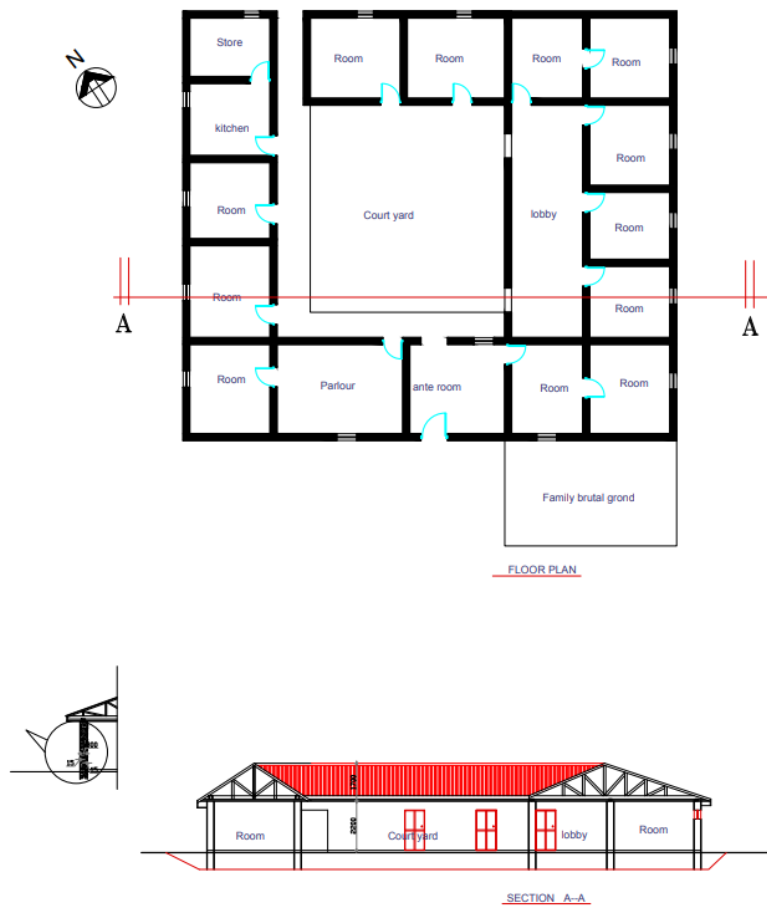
Floor plan and section of Case study building C by AutoCAD 2023
